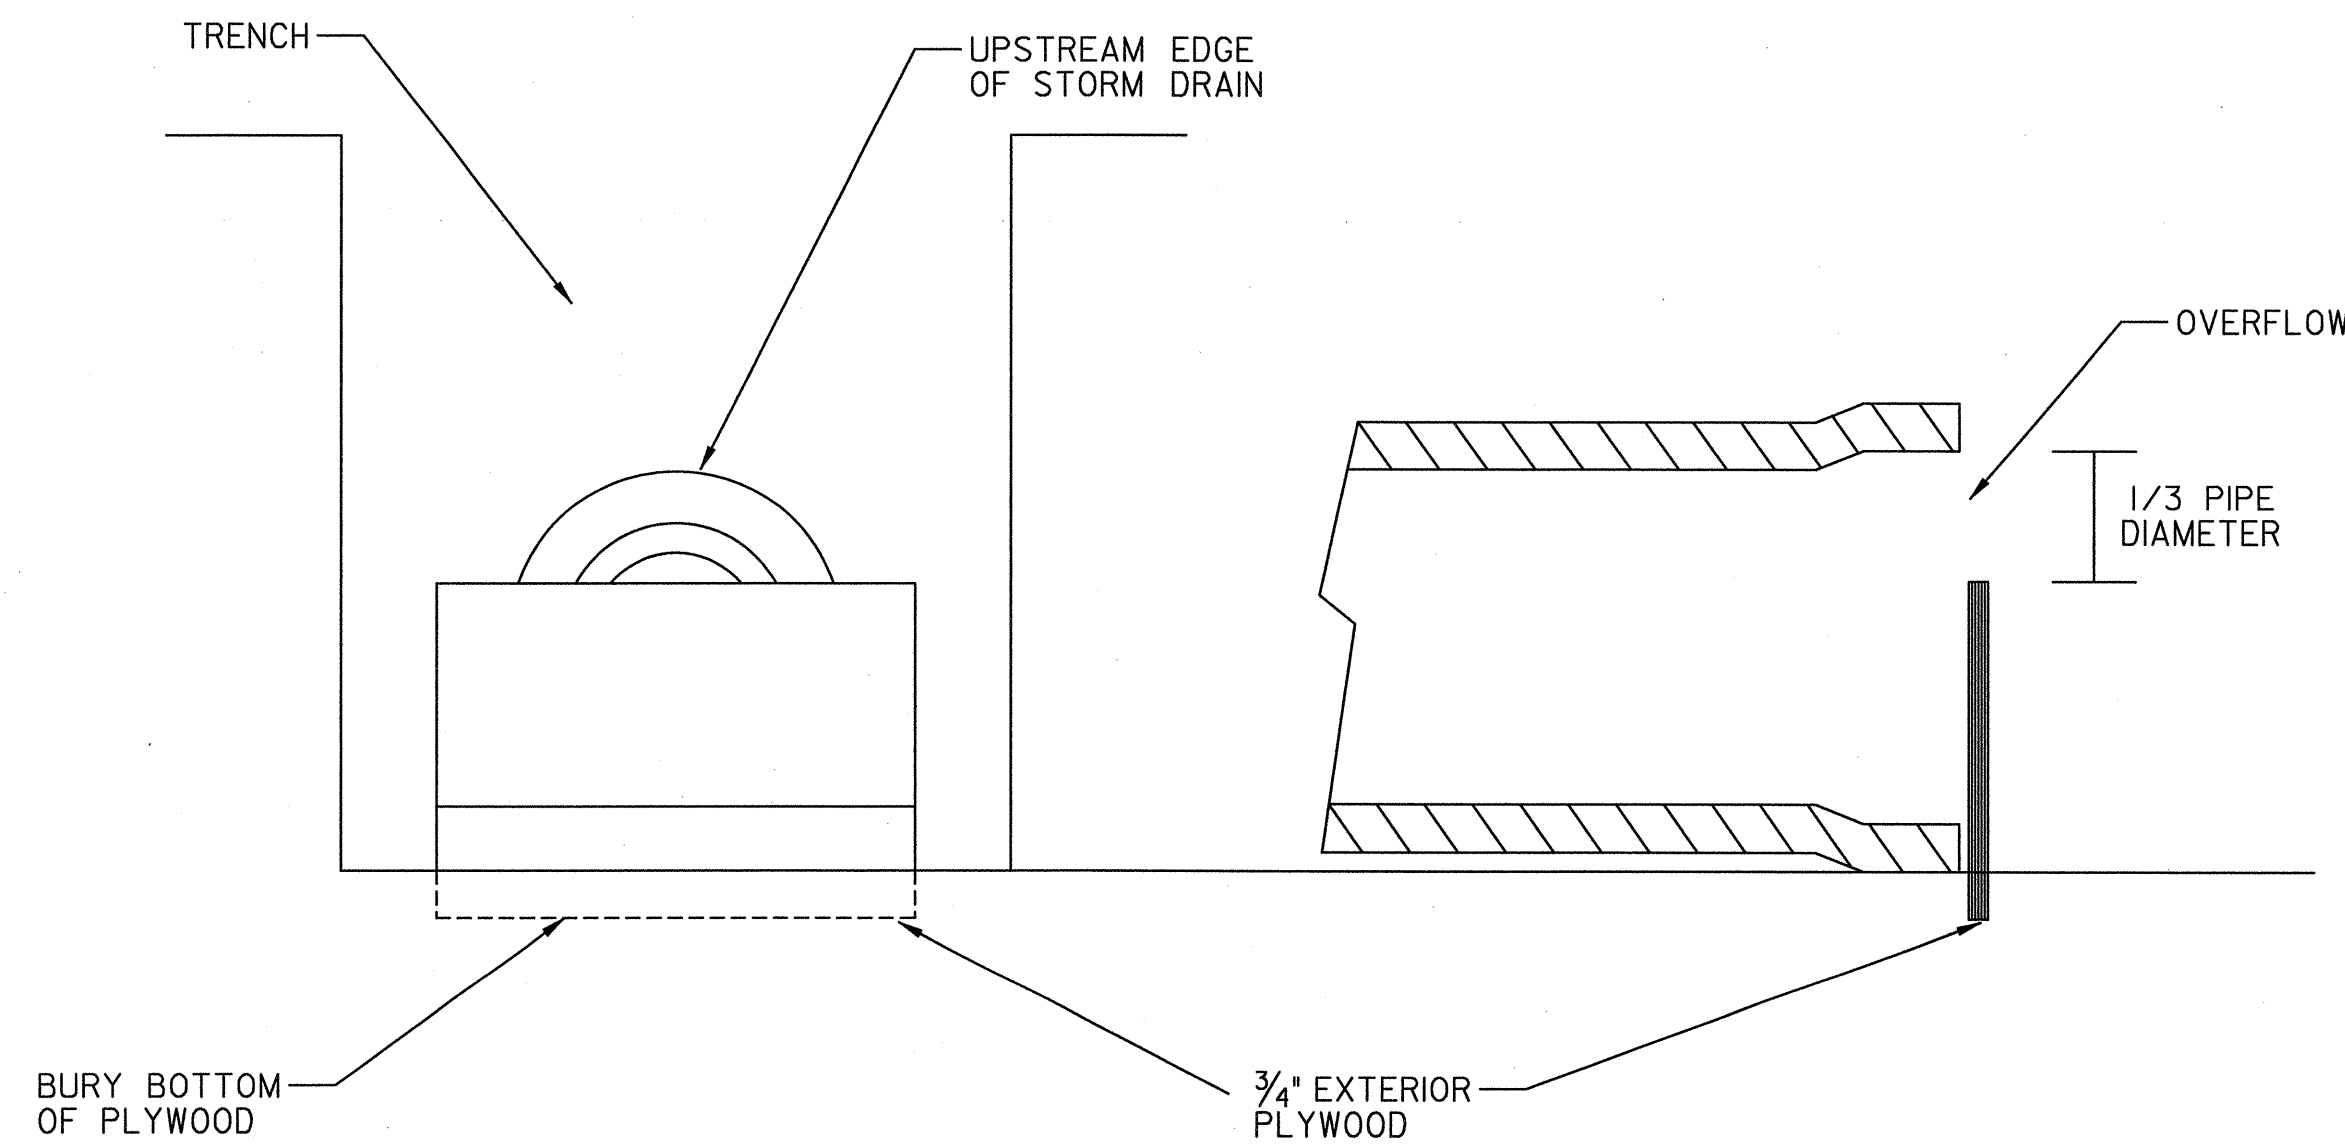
PLYWOOD INLET PROTECTION FOR STORM DRAIN UNDER CONSTRUCTION
